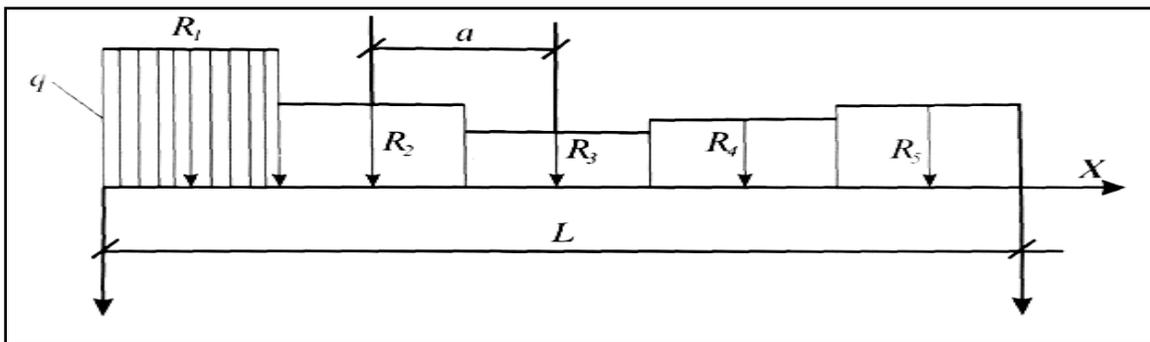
(b): Girders in roof systems, cross beam reactions on the main beam (secondary girders)
